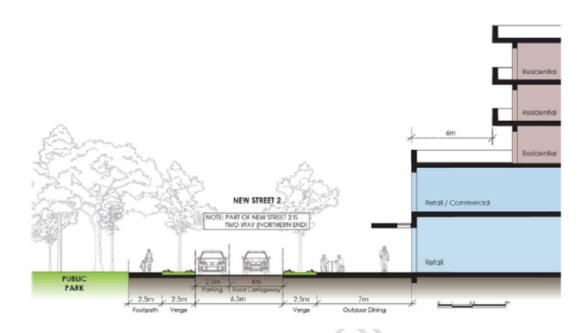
New Street 2 Setbacks - Southern End - Section D-D
